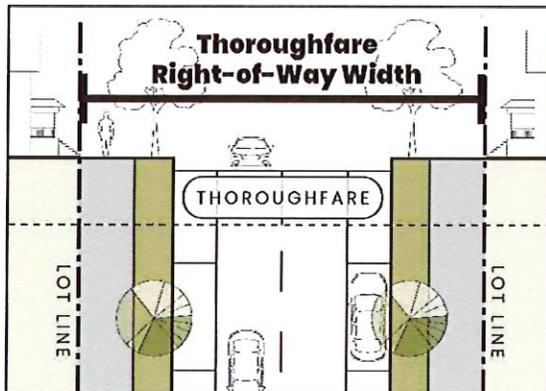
F: Thoroughfare Right-of-Way Width Measurement
